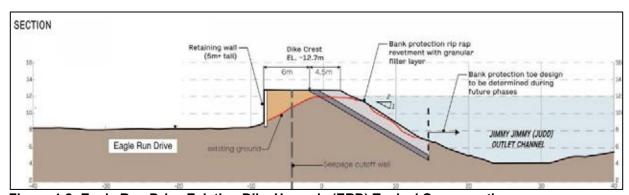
Eagle Run Drive Existing Dike Upgrade (ERD) Typical Cross-section
